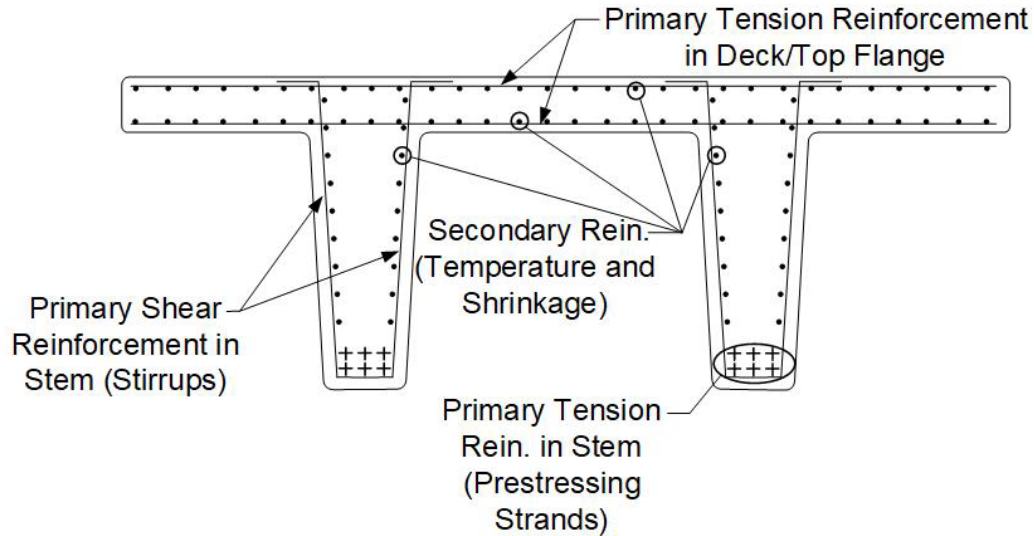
Steel Reinforcement in a Prestressed Double Tee Beam
